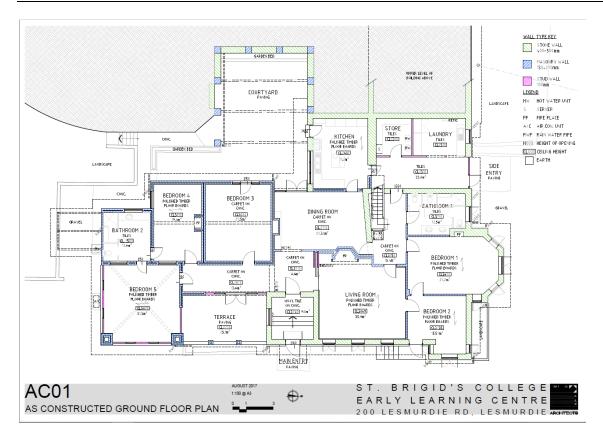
Existing ground floor plan, Courtesy: Saleeba Adams Architects
